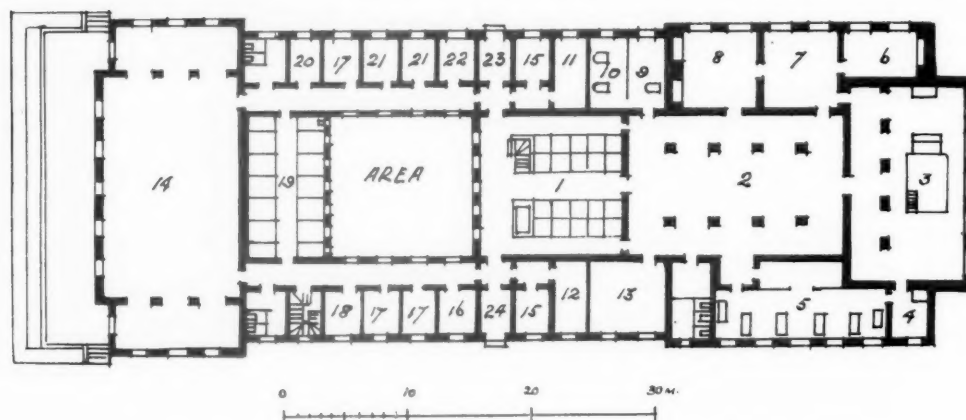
GROUND FLOOR PLAN OF THE BATH-HOUSE, THE VIRCHOW HOSPITAL, BERLIN.
